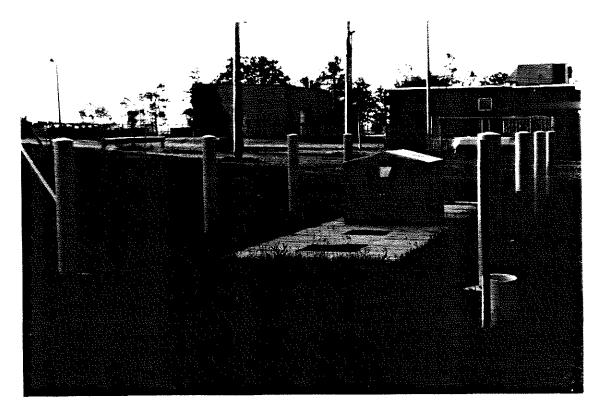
SEAD-61, 9/13/90. View of Underground Waste Oil Tank - Building 718, facing southeast.
